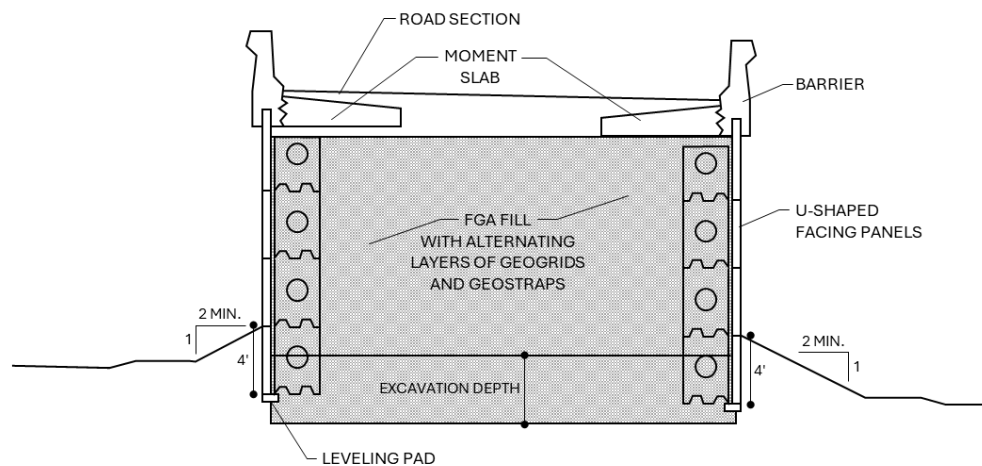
Typical cross-section of ramp (redrawn from Loux and Filshill 2022).
